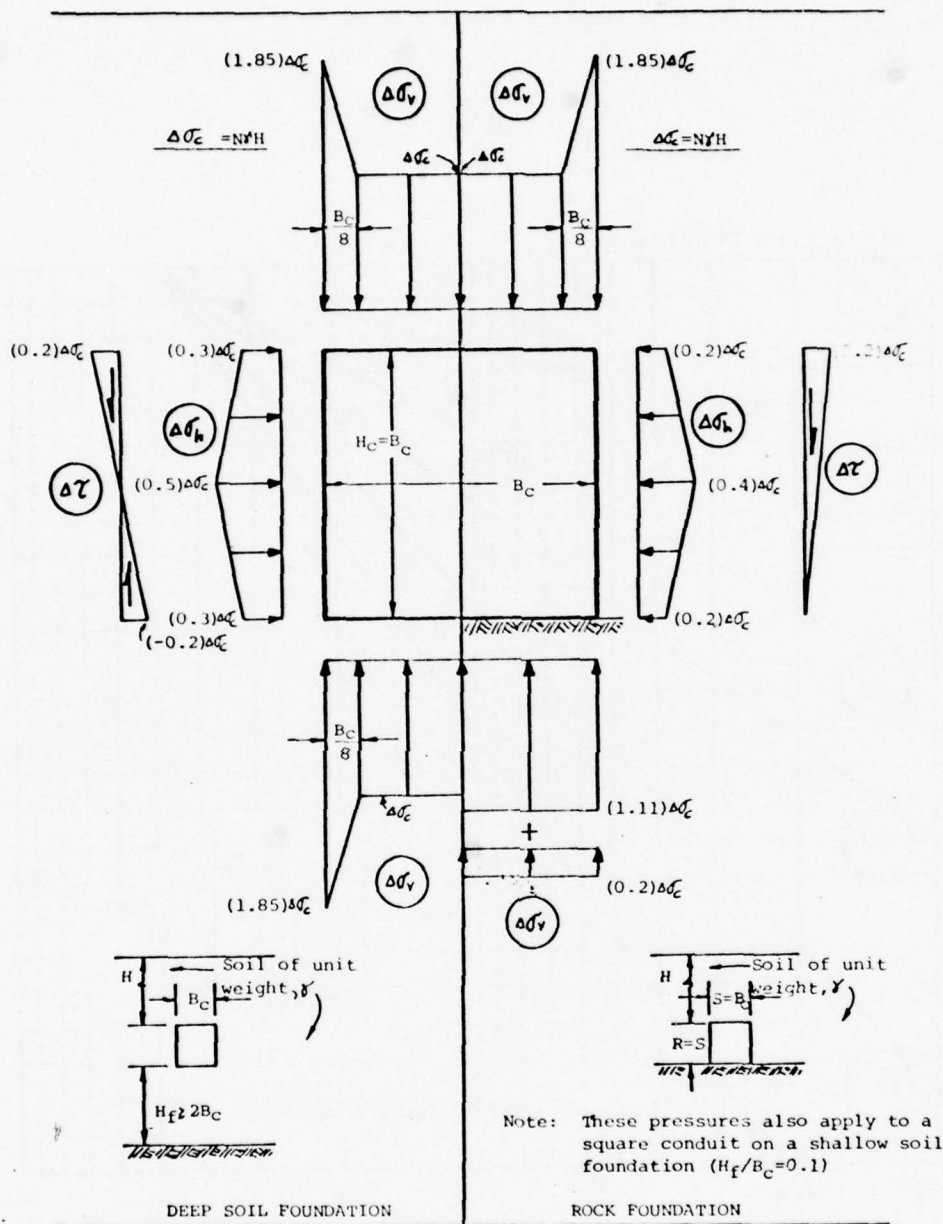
EARTH PRESSURE DIAGRAMS FOR A SQUARE CONDUIT ON DEEP SOIL AND ROCK FOUNDATIONS
